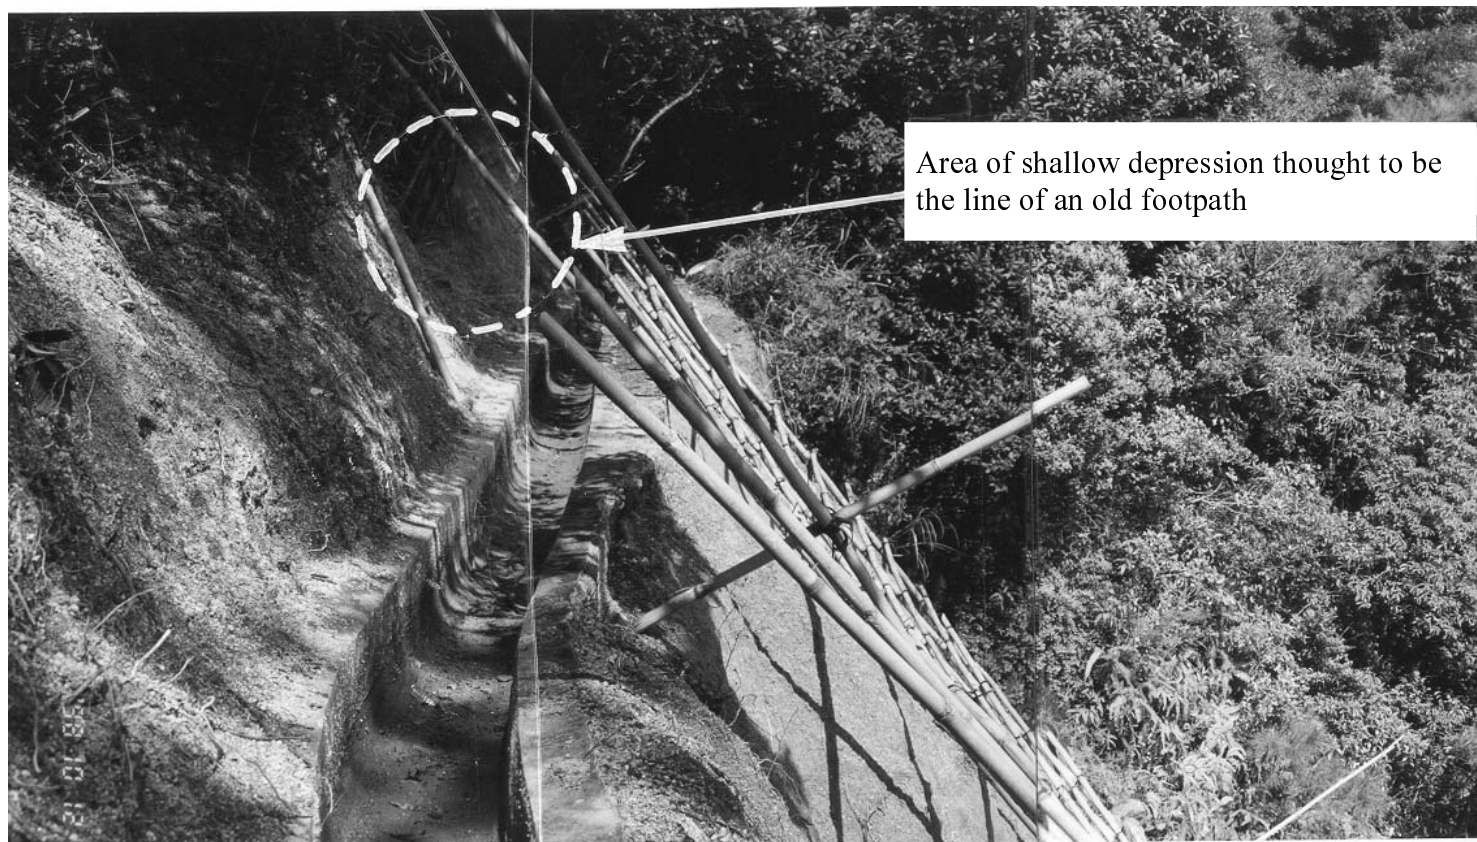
View of the Drainage Channel above the Crown of the Landslide
